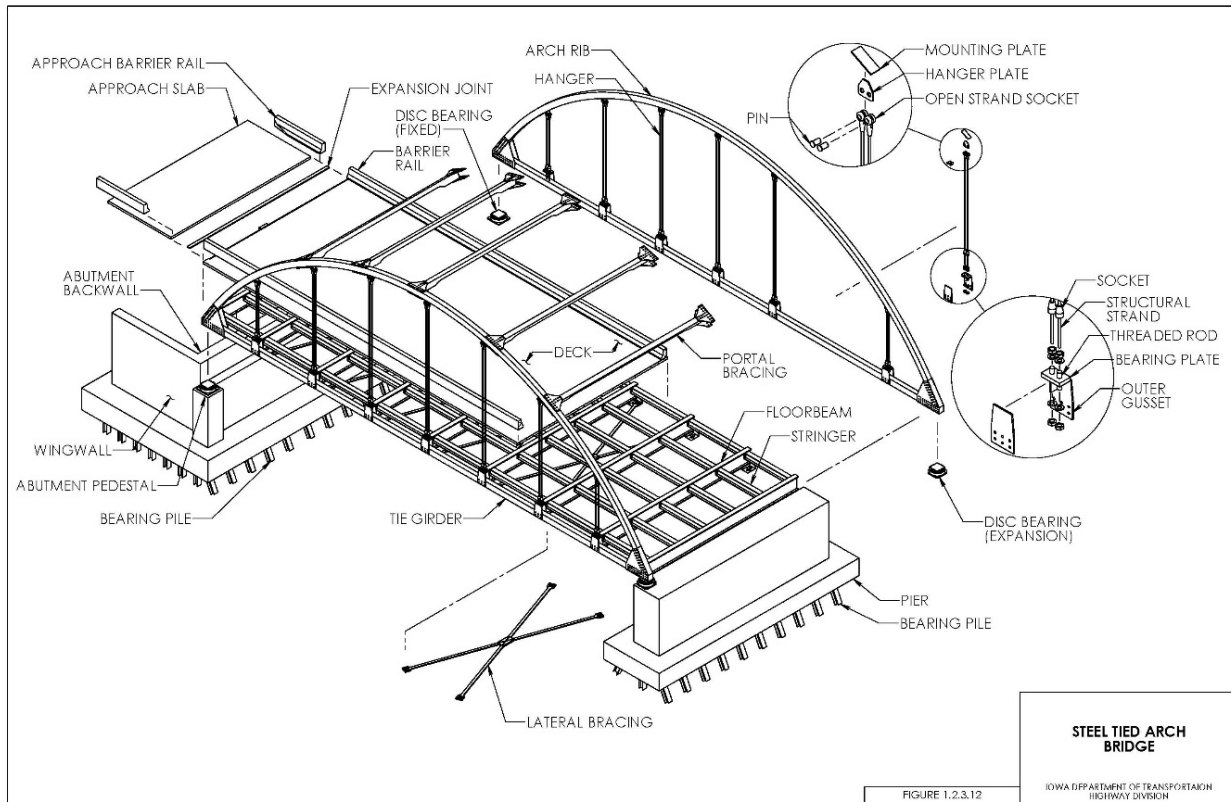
Steel Tied Arch Bridge Components
